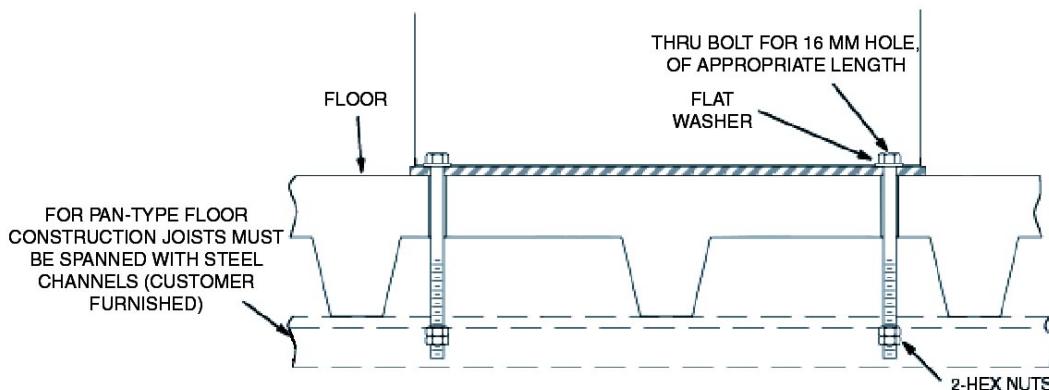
Thru-Bolt Floor Mounting (Pan-Type Floor Construction)
